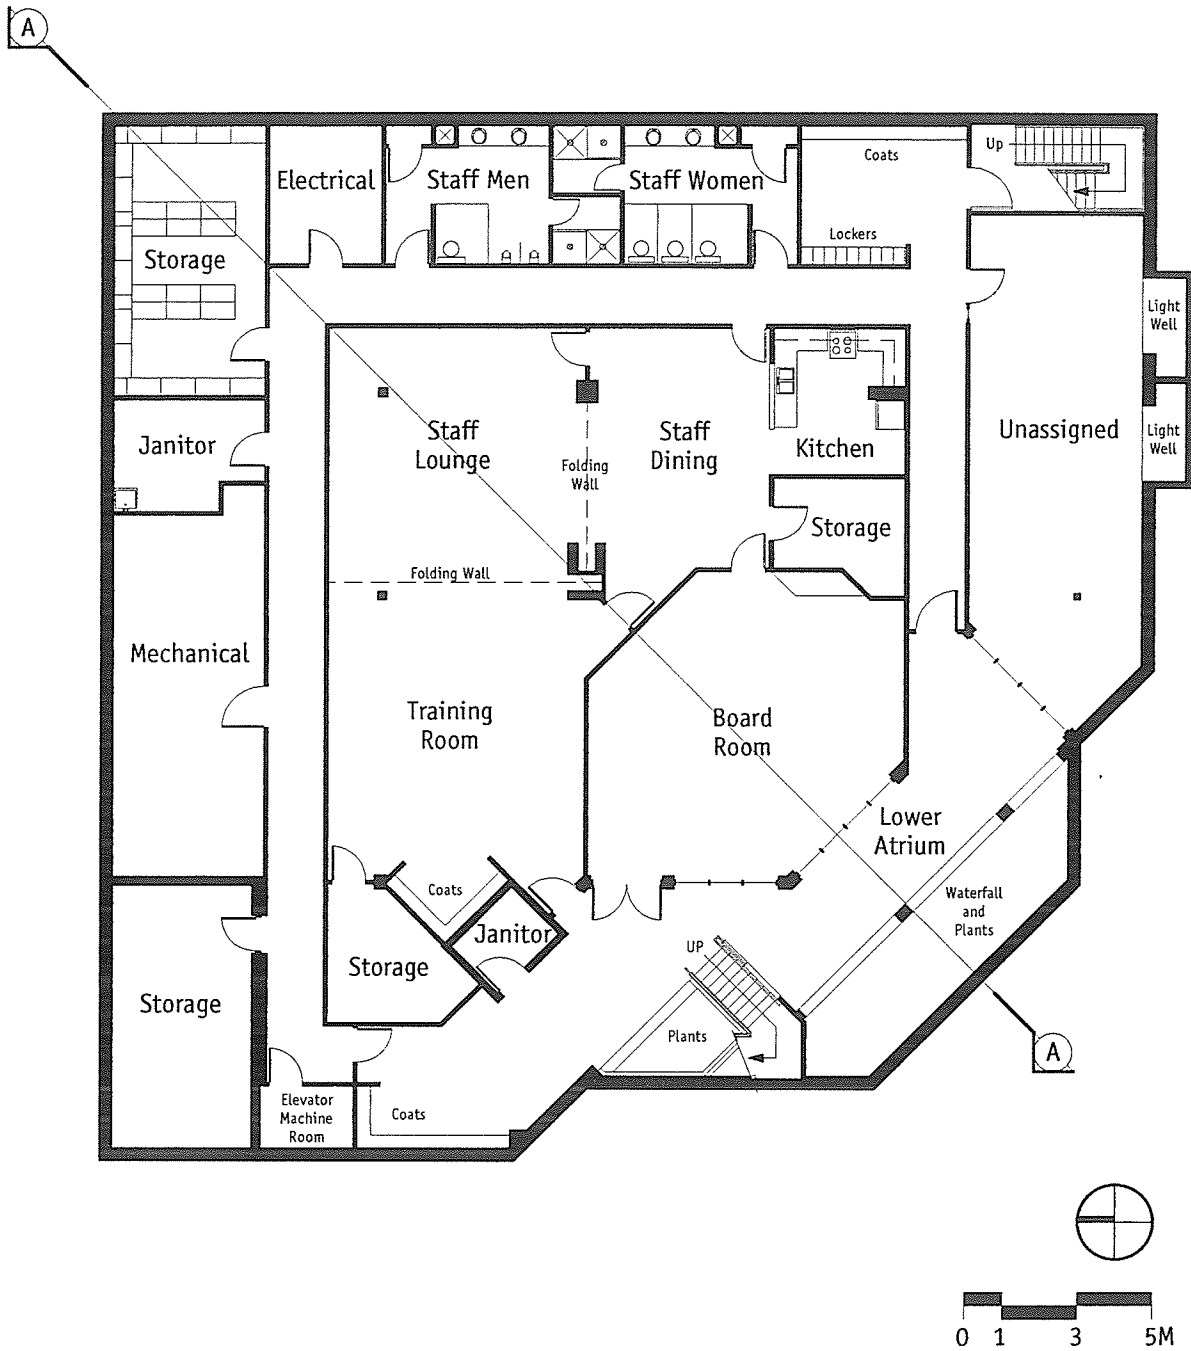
Basement, floorplan. Original computer drawing courtesy of the architect. Drawing by the author.
